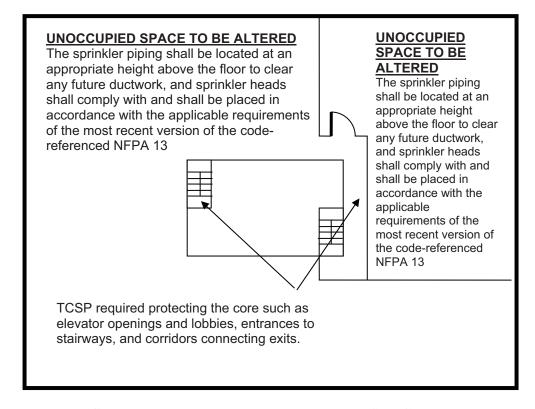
ALTERATION ON AN ENTIRE, EXISTING FULLY SPRINKLERED FLOOR
